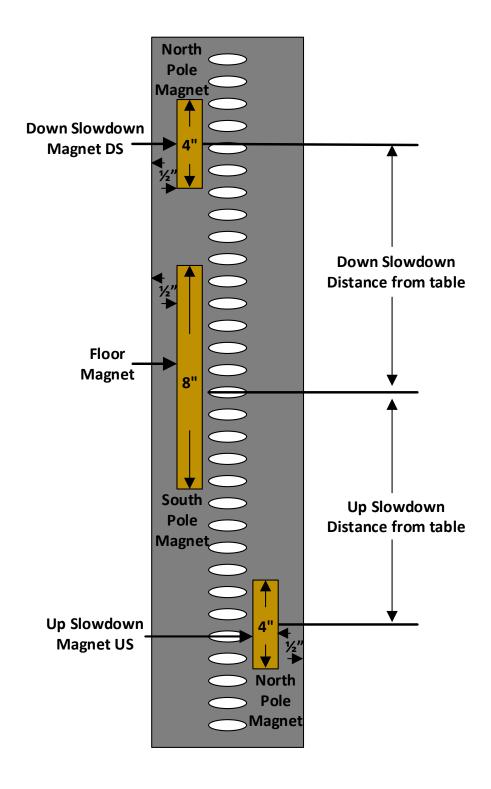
Selector Magnet Placement (GALX-1011BN board)
